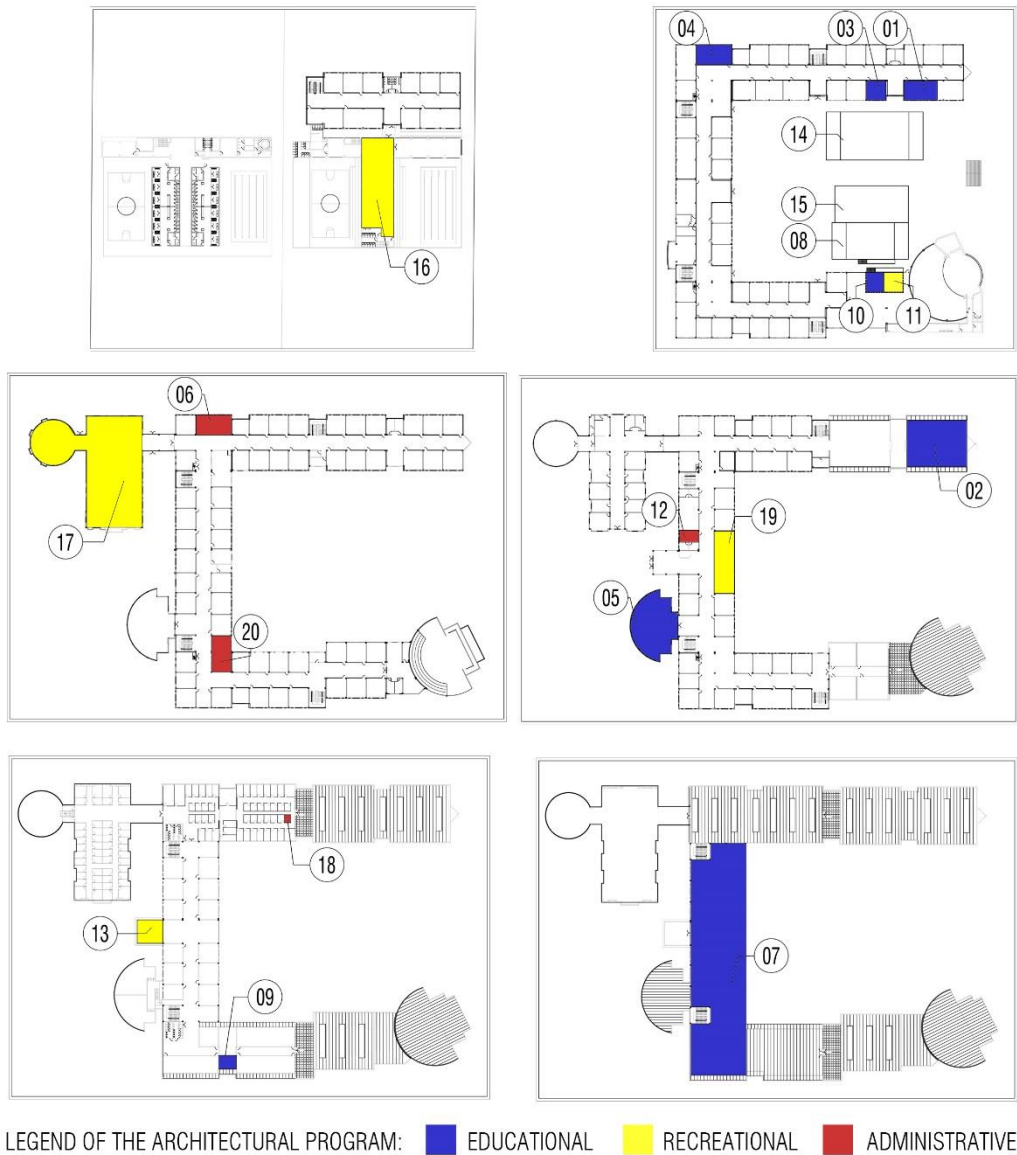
Layout Plans of AREL Tepekent Campus Monoblock Building:
